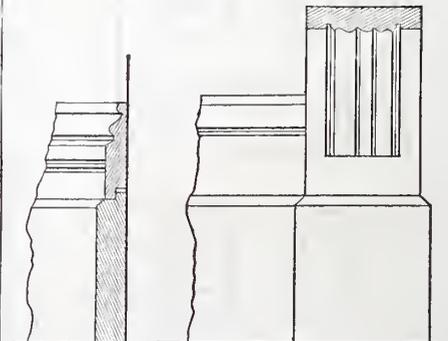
Section of Base and Door Casing, with Plinth of Doors.—Scale $1\frac{1}{2}$ Inches to the Foot.
